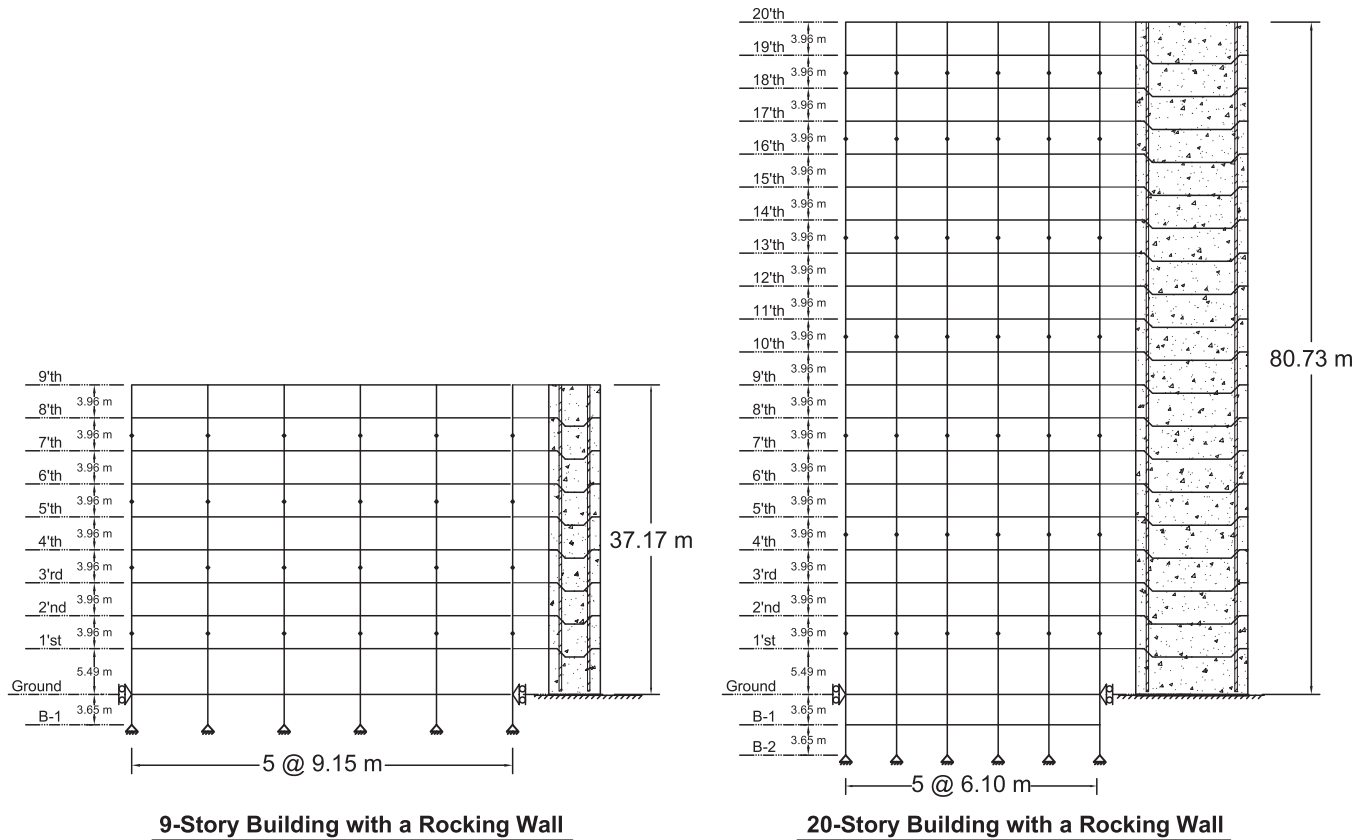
| Elevation views of the 9-story and 20-story steel moment-resisting frames retrofitted with a stepping rocking wall.
